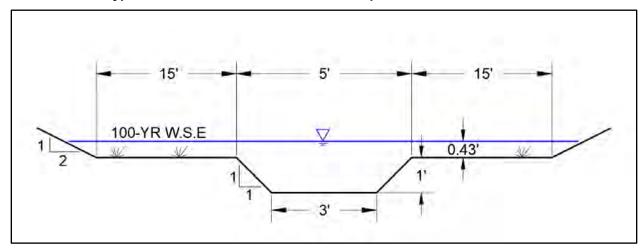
Typical Cross Section Downstream of Proposed Dublin Boulevard
